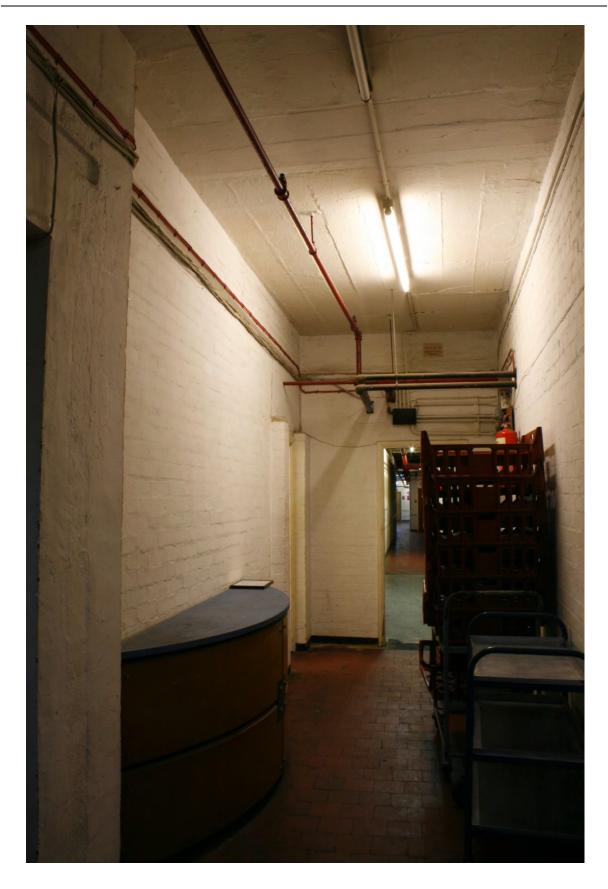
Ground floor access corridor within the storage area on the north side of the building, looking north-east (72FmLa D100 049)
